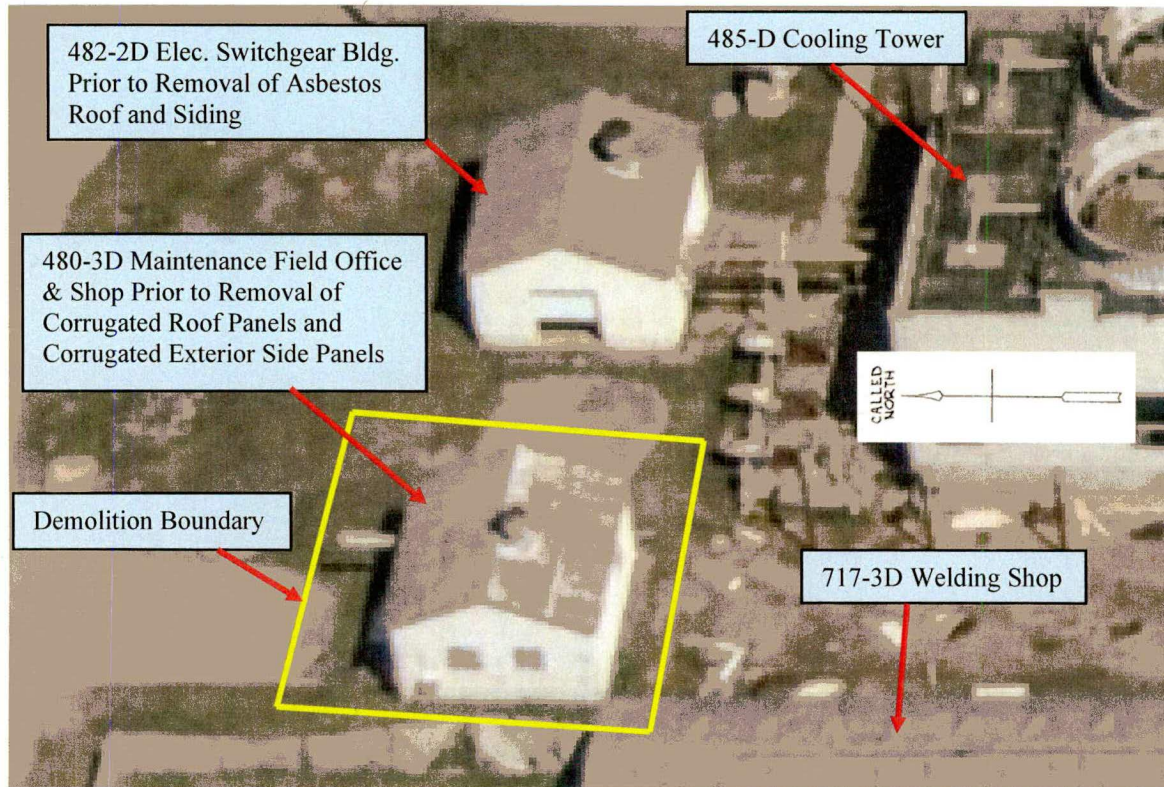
Aerial View of 480-3D and Surrounding Buildings/Facilities
